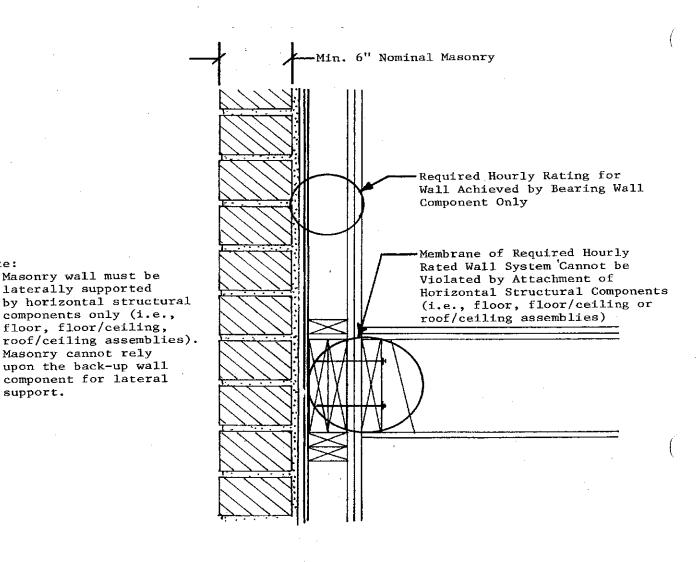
A Combination Masonry/Frame Wall (Bearing and Non-Bearing Condition)
